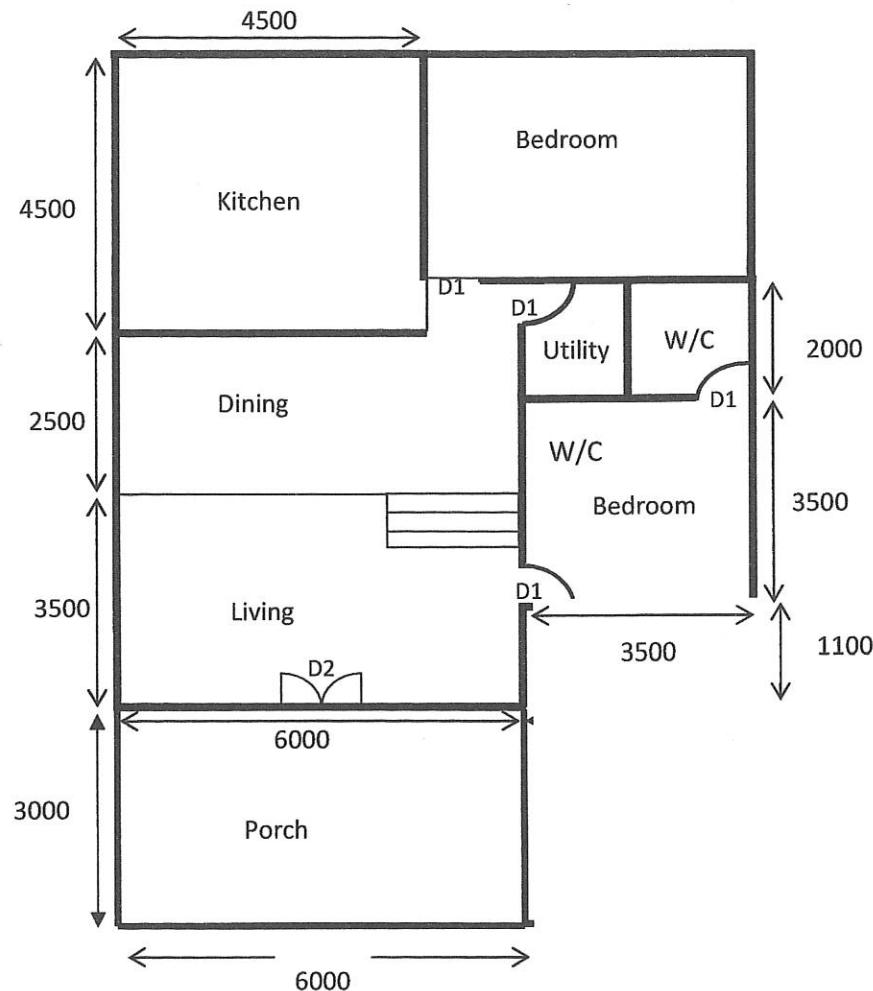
/Rajah B1: Floor Plan / Plan Lantai
